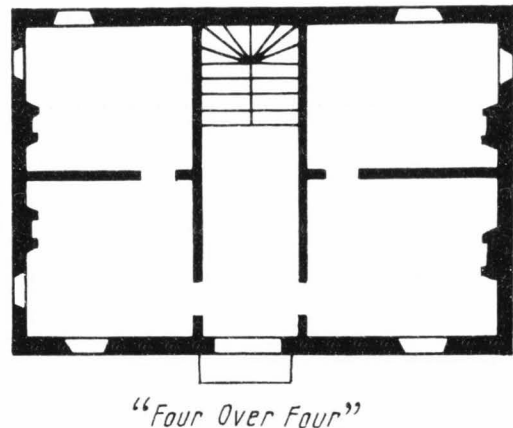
Floor plan of "Four over Four" house. (After Richard Francaviglia, *Mormon Central-Hall Houses*, 1971)
